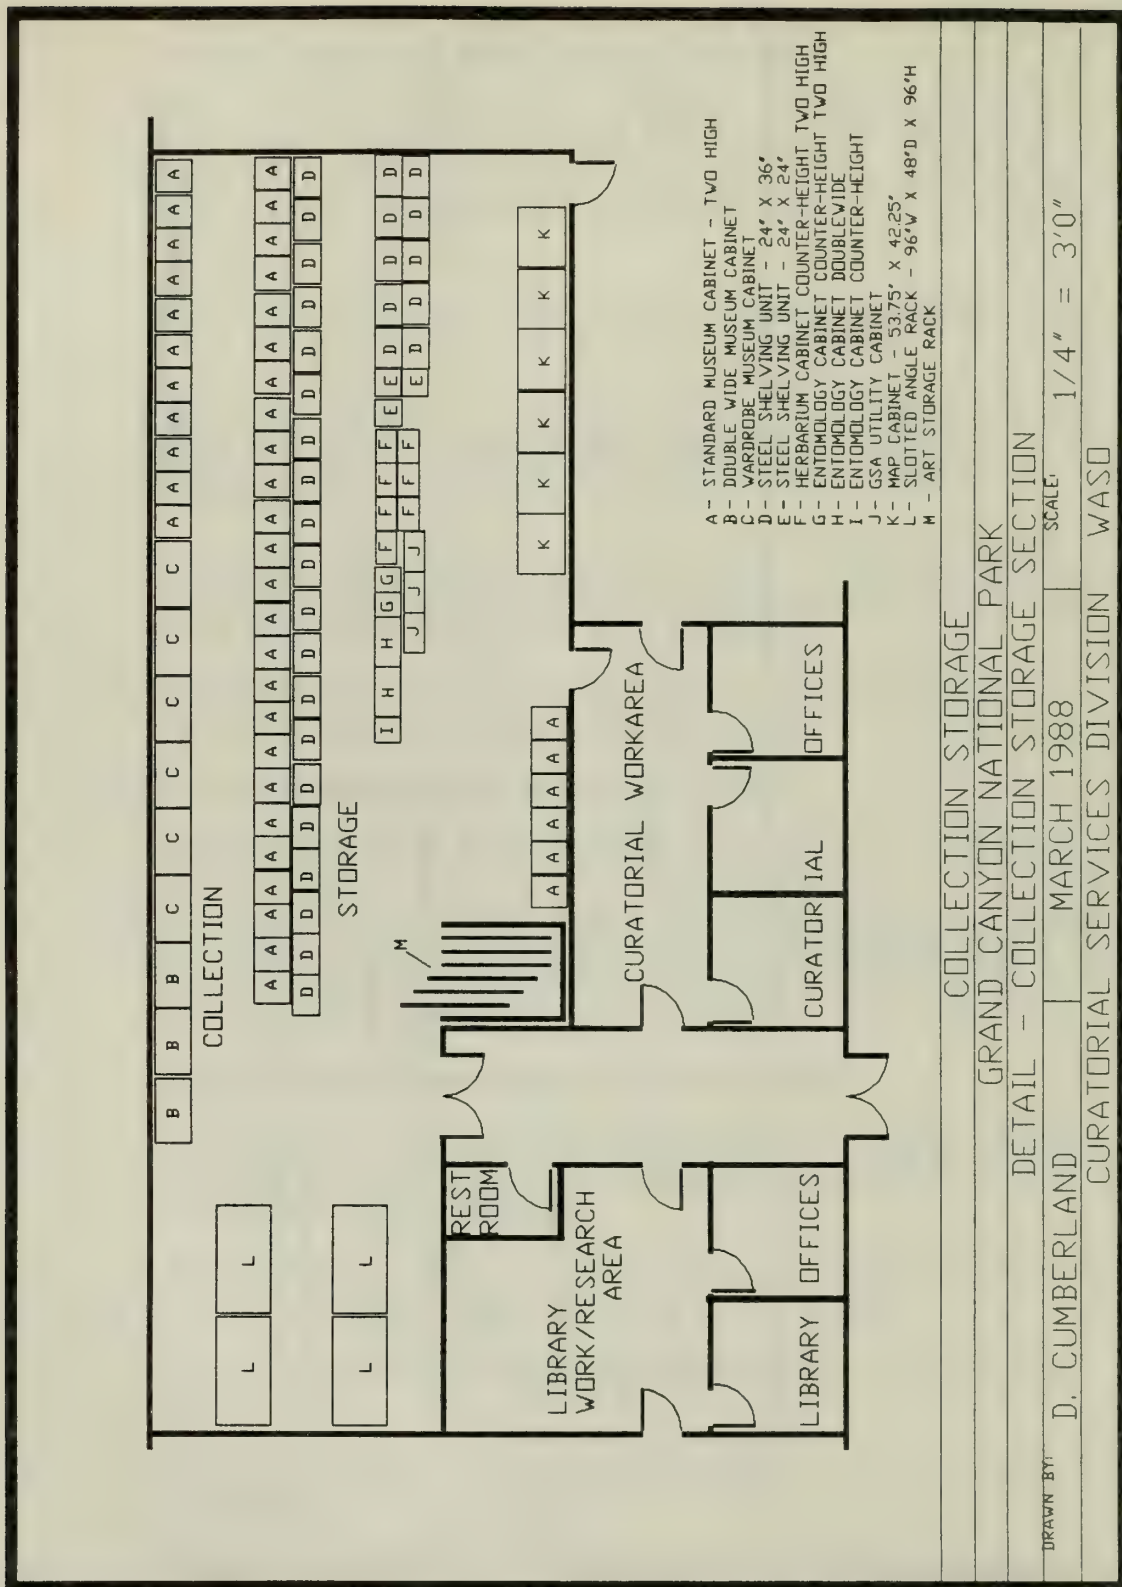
Floor Plan of Proposed Museum Collection Space at Grand Canyon National Park. Drawn with Autocad® Computer Assisted Design Program.
